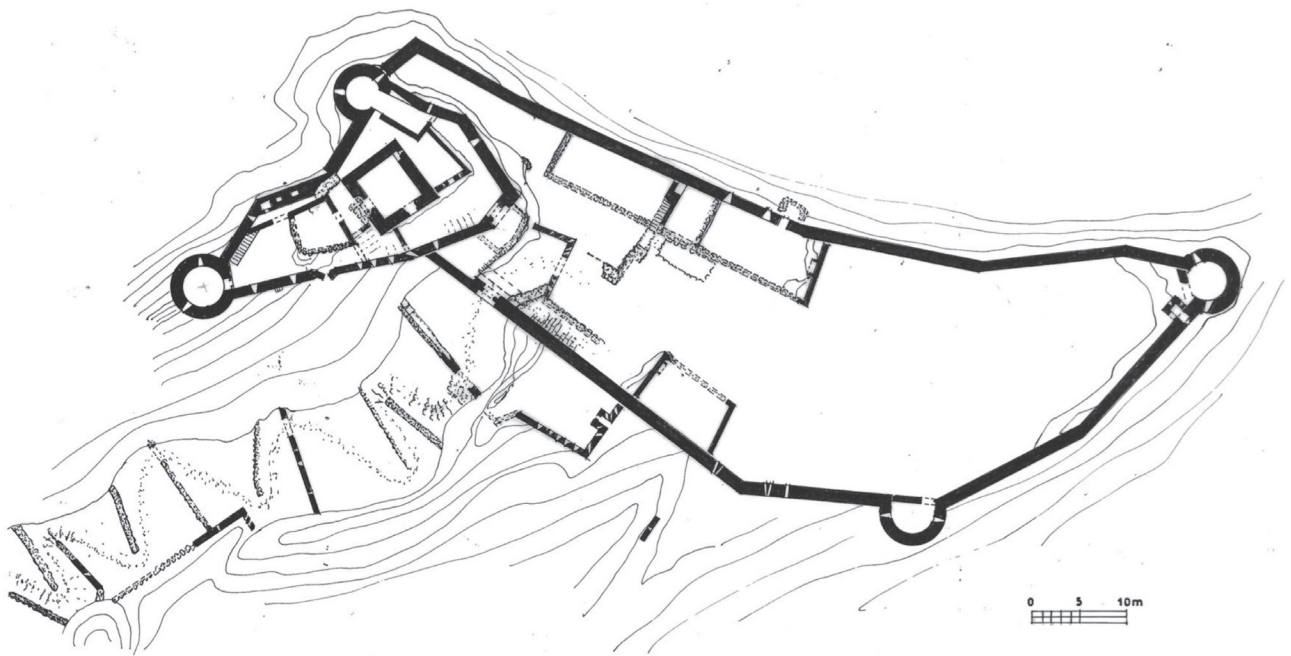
Plan of Puylaurens castle (Lucien Bayrou)
